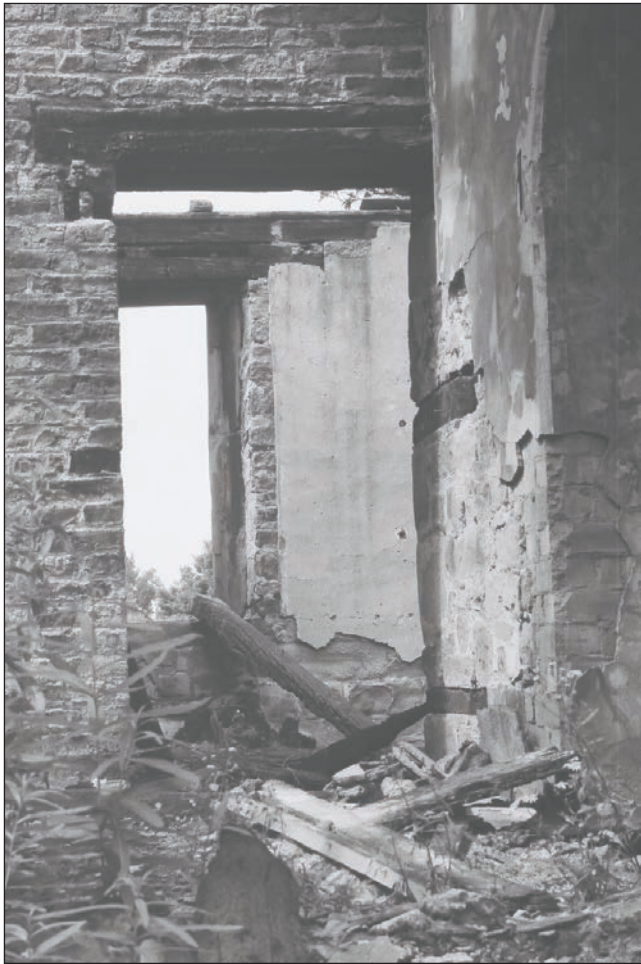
View of doorway from F5 to F1, Building 3, from F3, Building 2 (Film 12.12)
